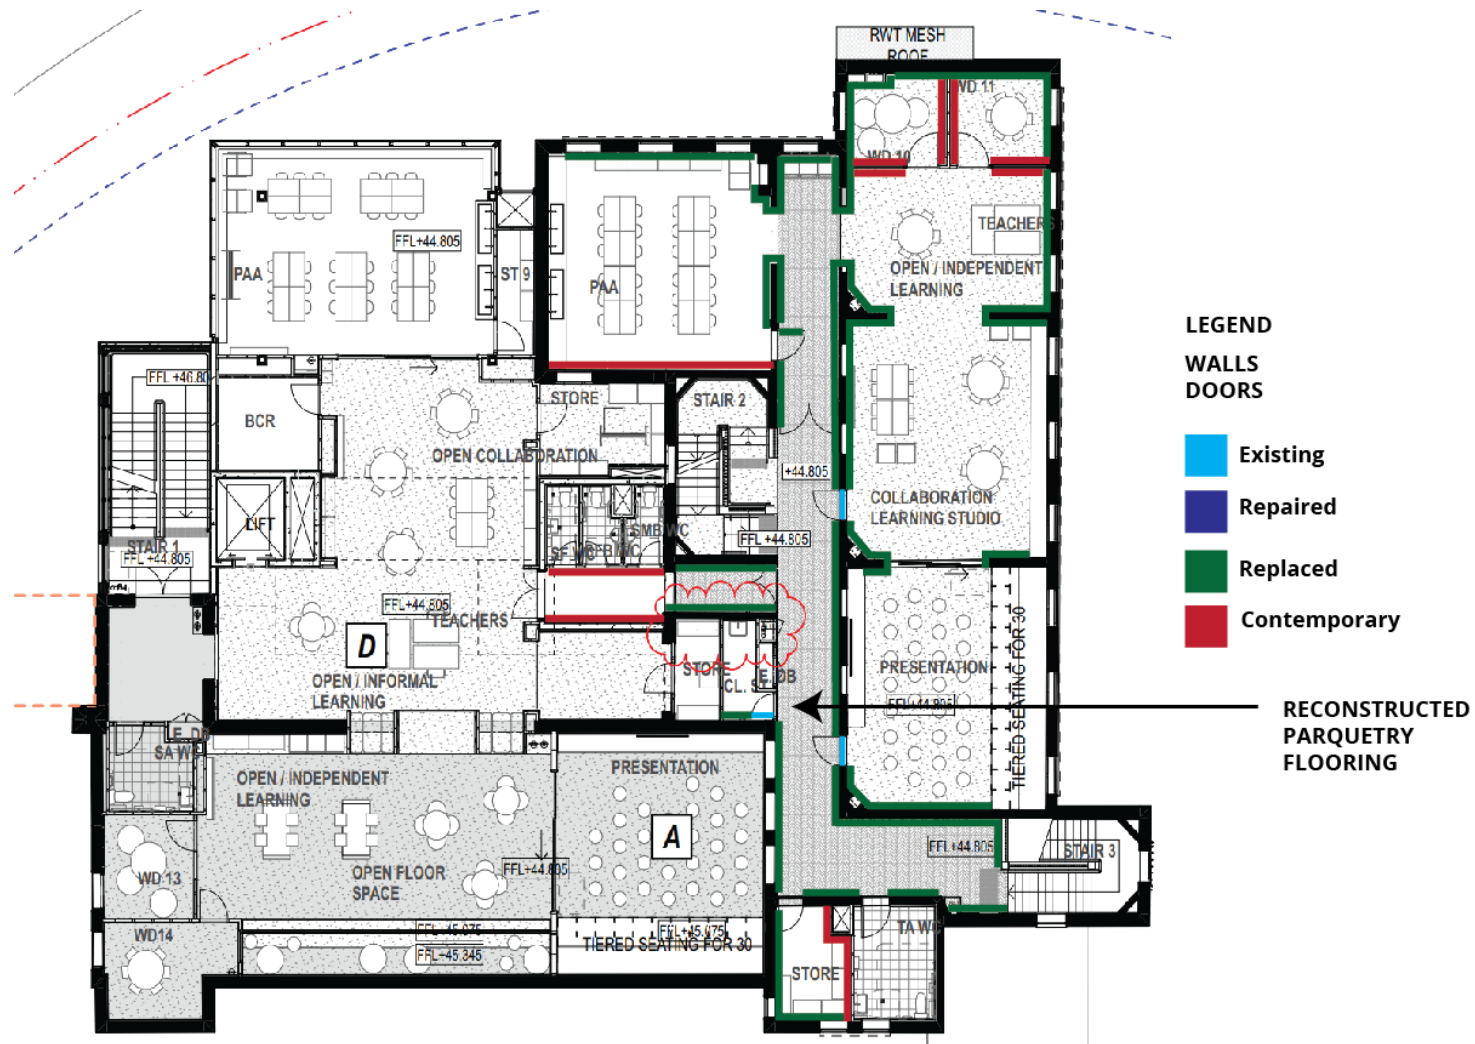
Fort Street Public School Building Level 1 floor plan – existing, repaired, replaced, contemporary fabric with Curio Overlay. FJC Studio
